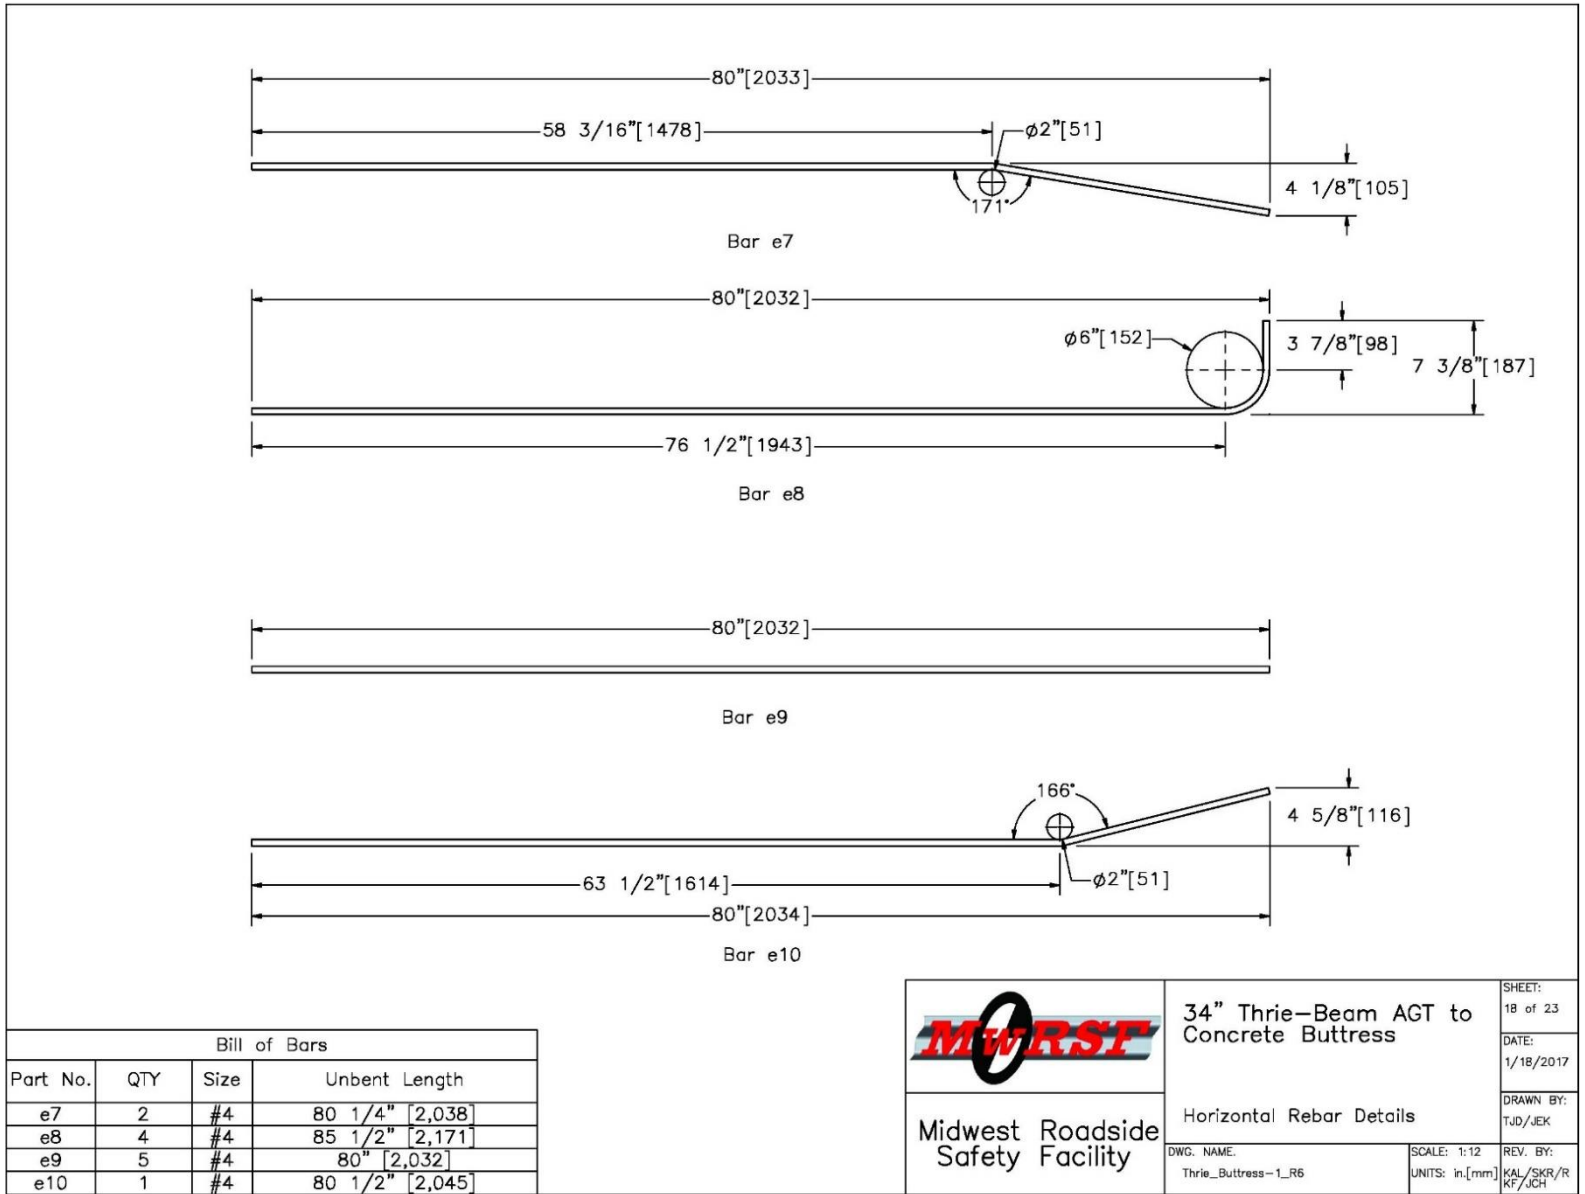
Horizontal Rebar Details, Test Nos. 34AGT-1 and 34AGT-2
